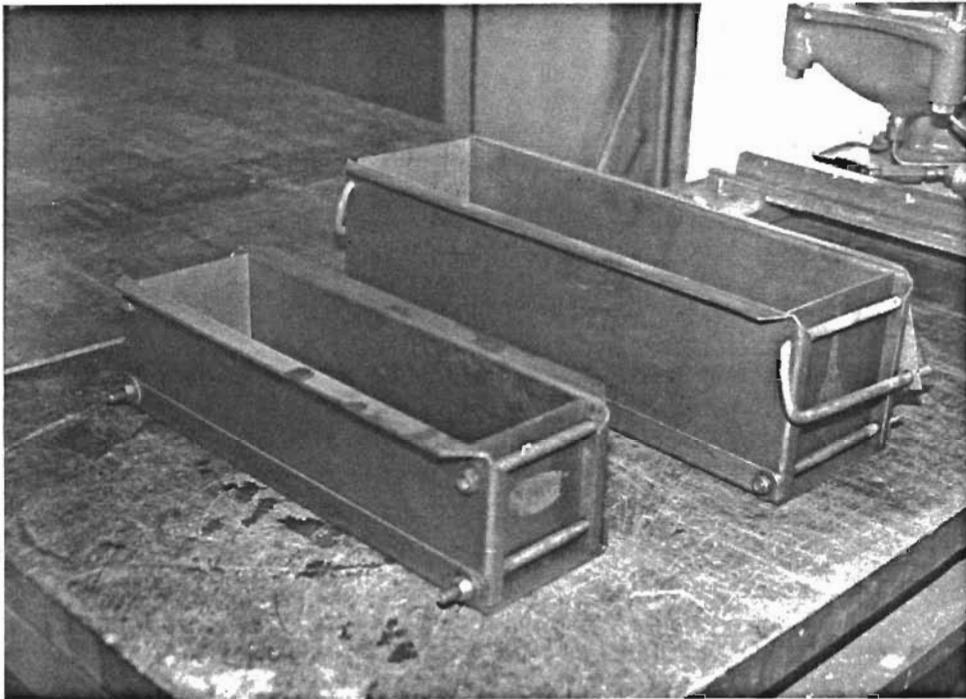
Beam mold construction for both 4.5-in. x 4.5-in. x 15.5-in. beams and 6-in. x 6-in. x 20-in. beams.
